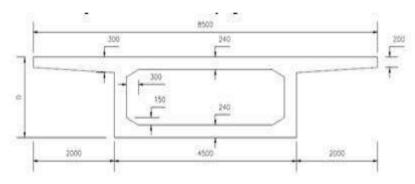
Cross-sectional dimensions of Rectangular Box Girder.
